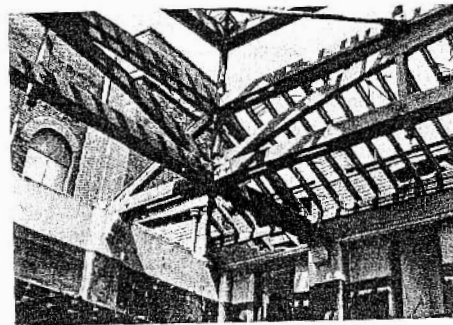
Rusholme Road Congregational Church Sunday School: External view of roof trusses, vertical glazing frame and upper sloping roof, June 1963 (Hesp)
